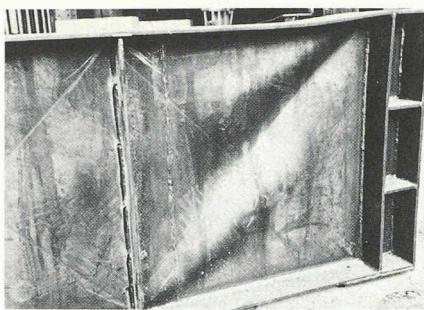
Typical collapse of a girder without longitudinal stiffener.
